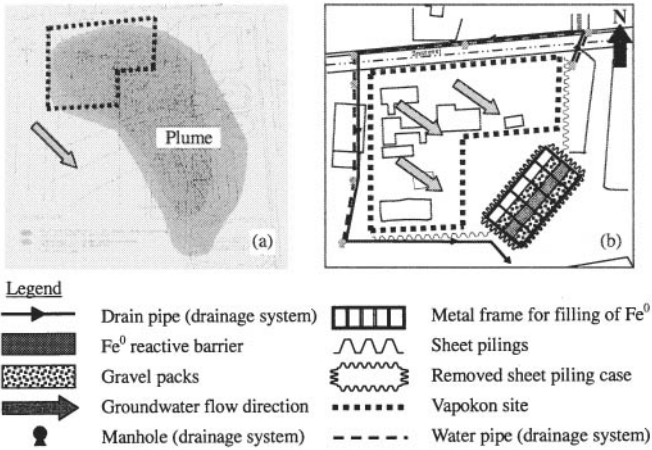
(a) Contaminant plume and (b) plan views of the funnel-and-gate iron reactive barrier and drainage system installed in Vapokon site, Denmark (adapted from Lai et al. 2006a)
